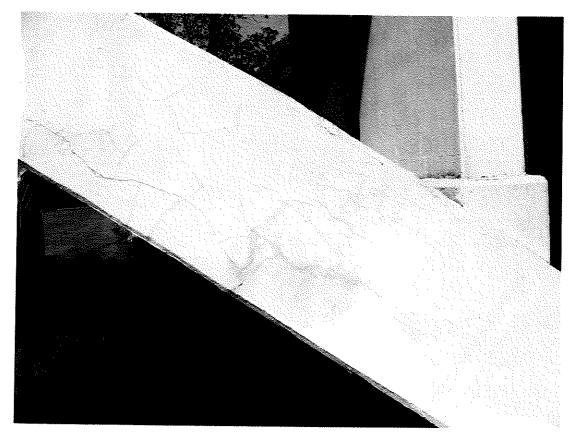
East Arch Between Spandrel Columns 15 & 16
